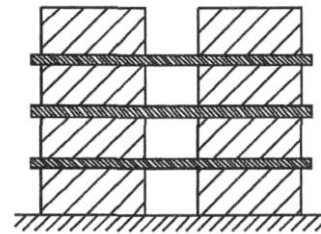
Composite structural systems. Type 3 - composite or concrete walls coupled by steel or composite beams.
